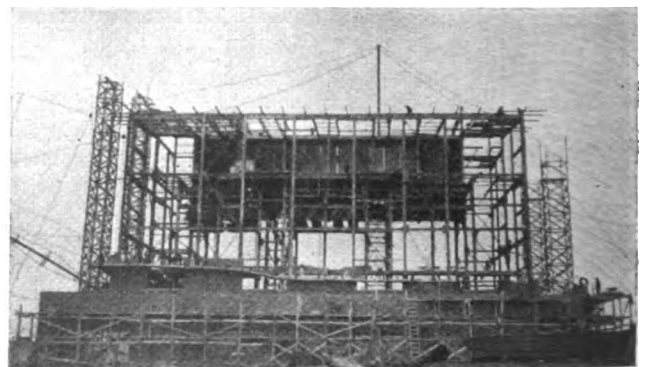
BUILDING BRICKWORK TO BOILER HOUSE.
